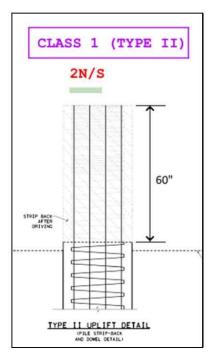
Passive Strand Development in Pier Foundation 1N, 1S, 2N, and 2S — Detail Provided by Others
